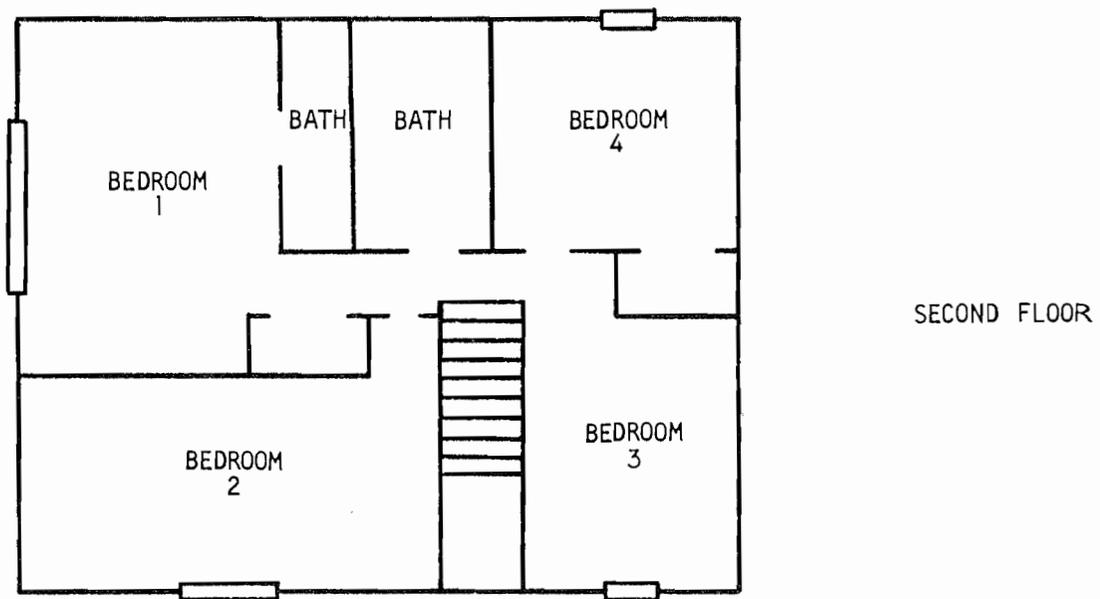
Floor Plan for the Characteristic Single-Family House in Chicago
